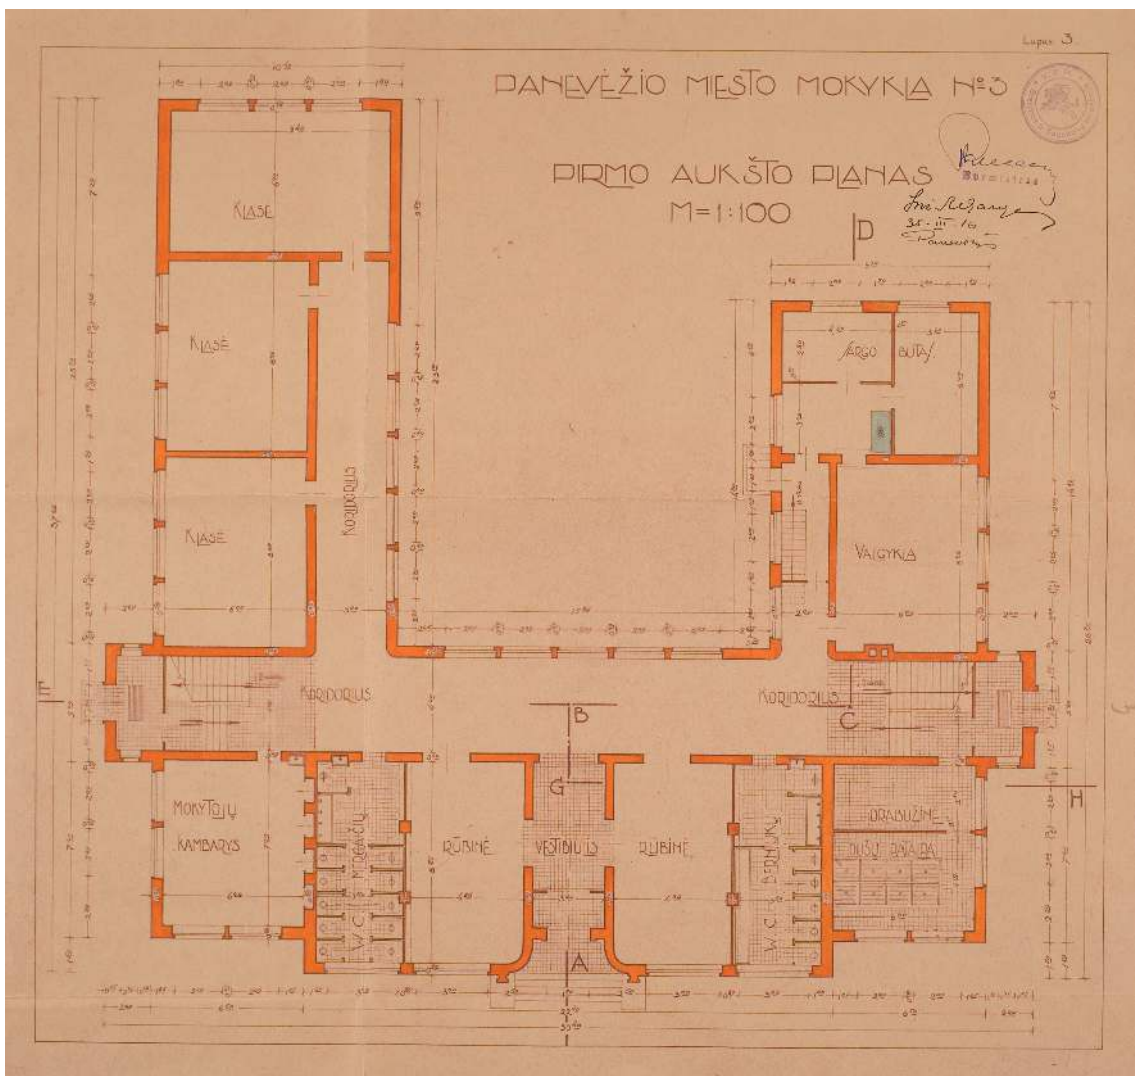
1st floor plan of 6-class primary school building on Ukmergės street, 1935. LCVA. f. 1622, ap. 4, b. 476, l. 3
